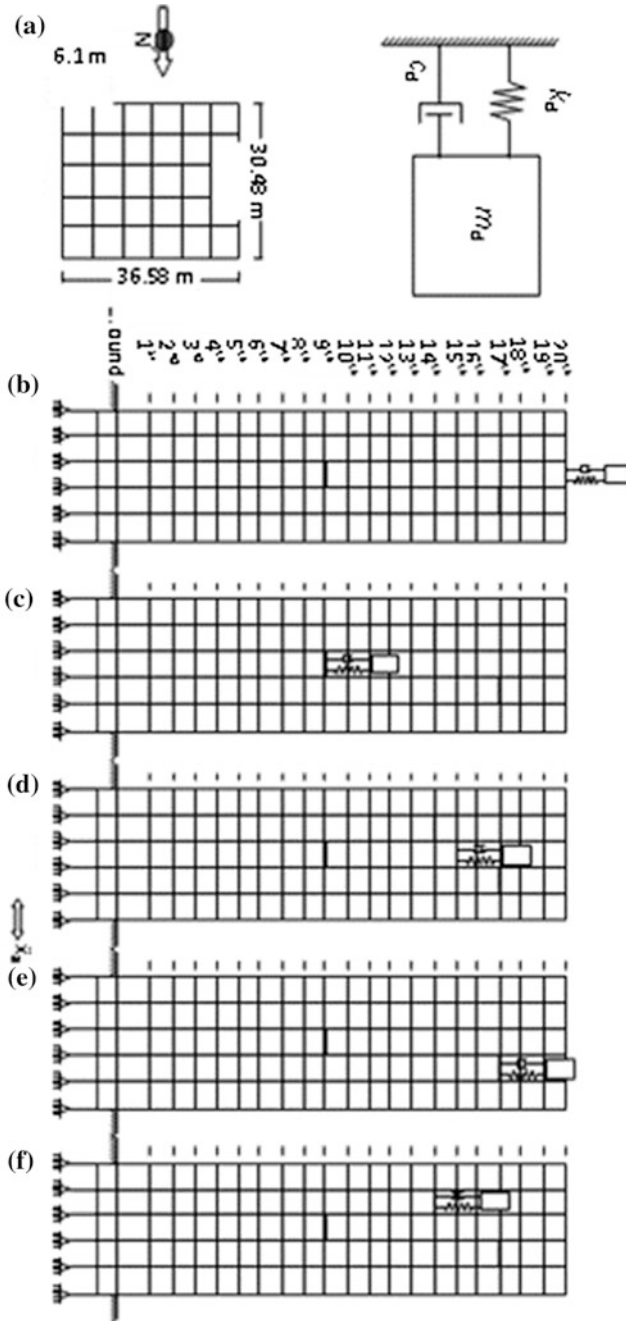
Model of 20-storey benchmark building. a Plan of the building and schematics of STMD, b elevation with STMD at top, c elevation with STMD at 9th, d elevation with STMD at 15th, e elevation with STMD at 17th and f elevation with STMD at 14th floor
